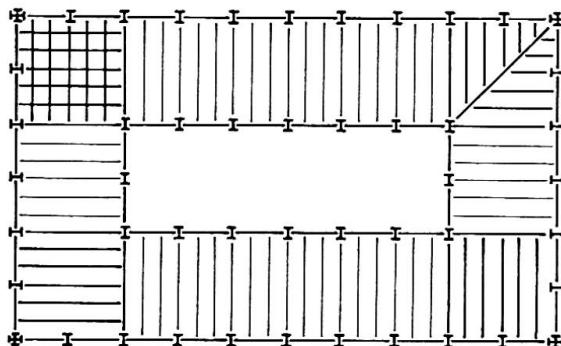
Typical Plan Showing Various Possible Corner Framings
